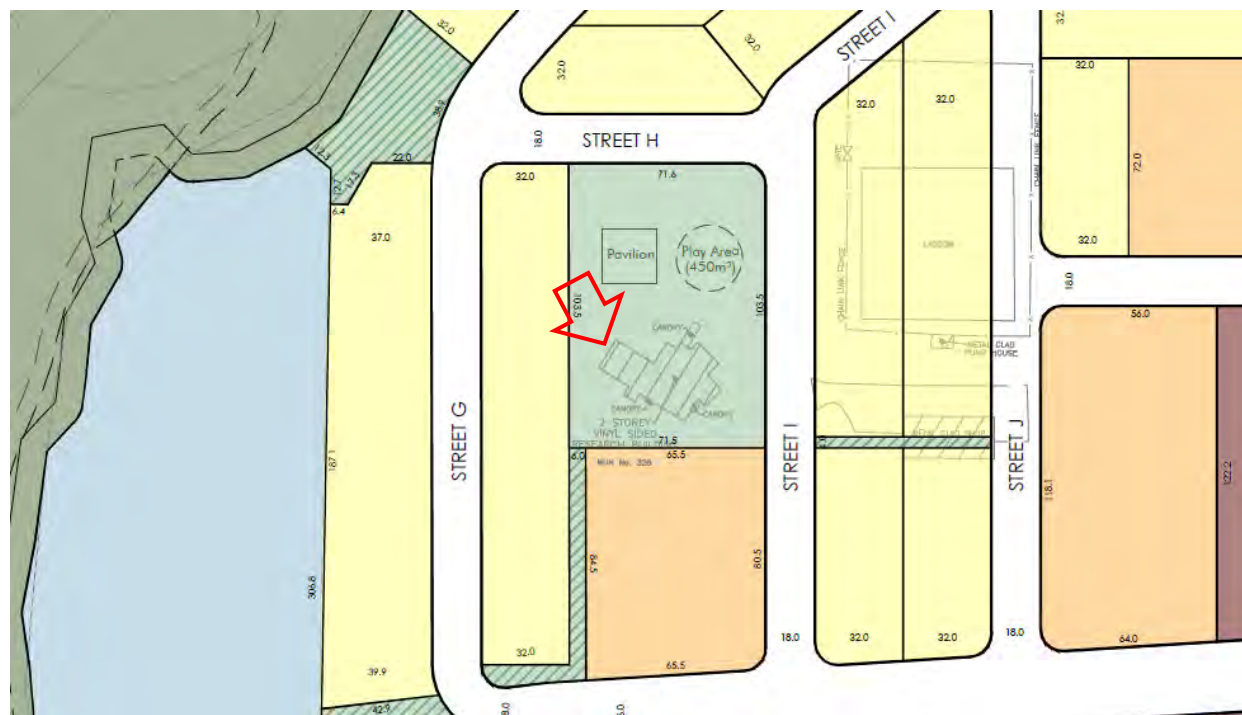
Detail of Proposed Plan of Subdivision noting former G.M. Frost building (existing location) (Source: MHBC, 2024)
